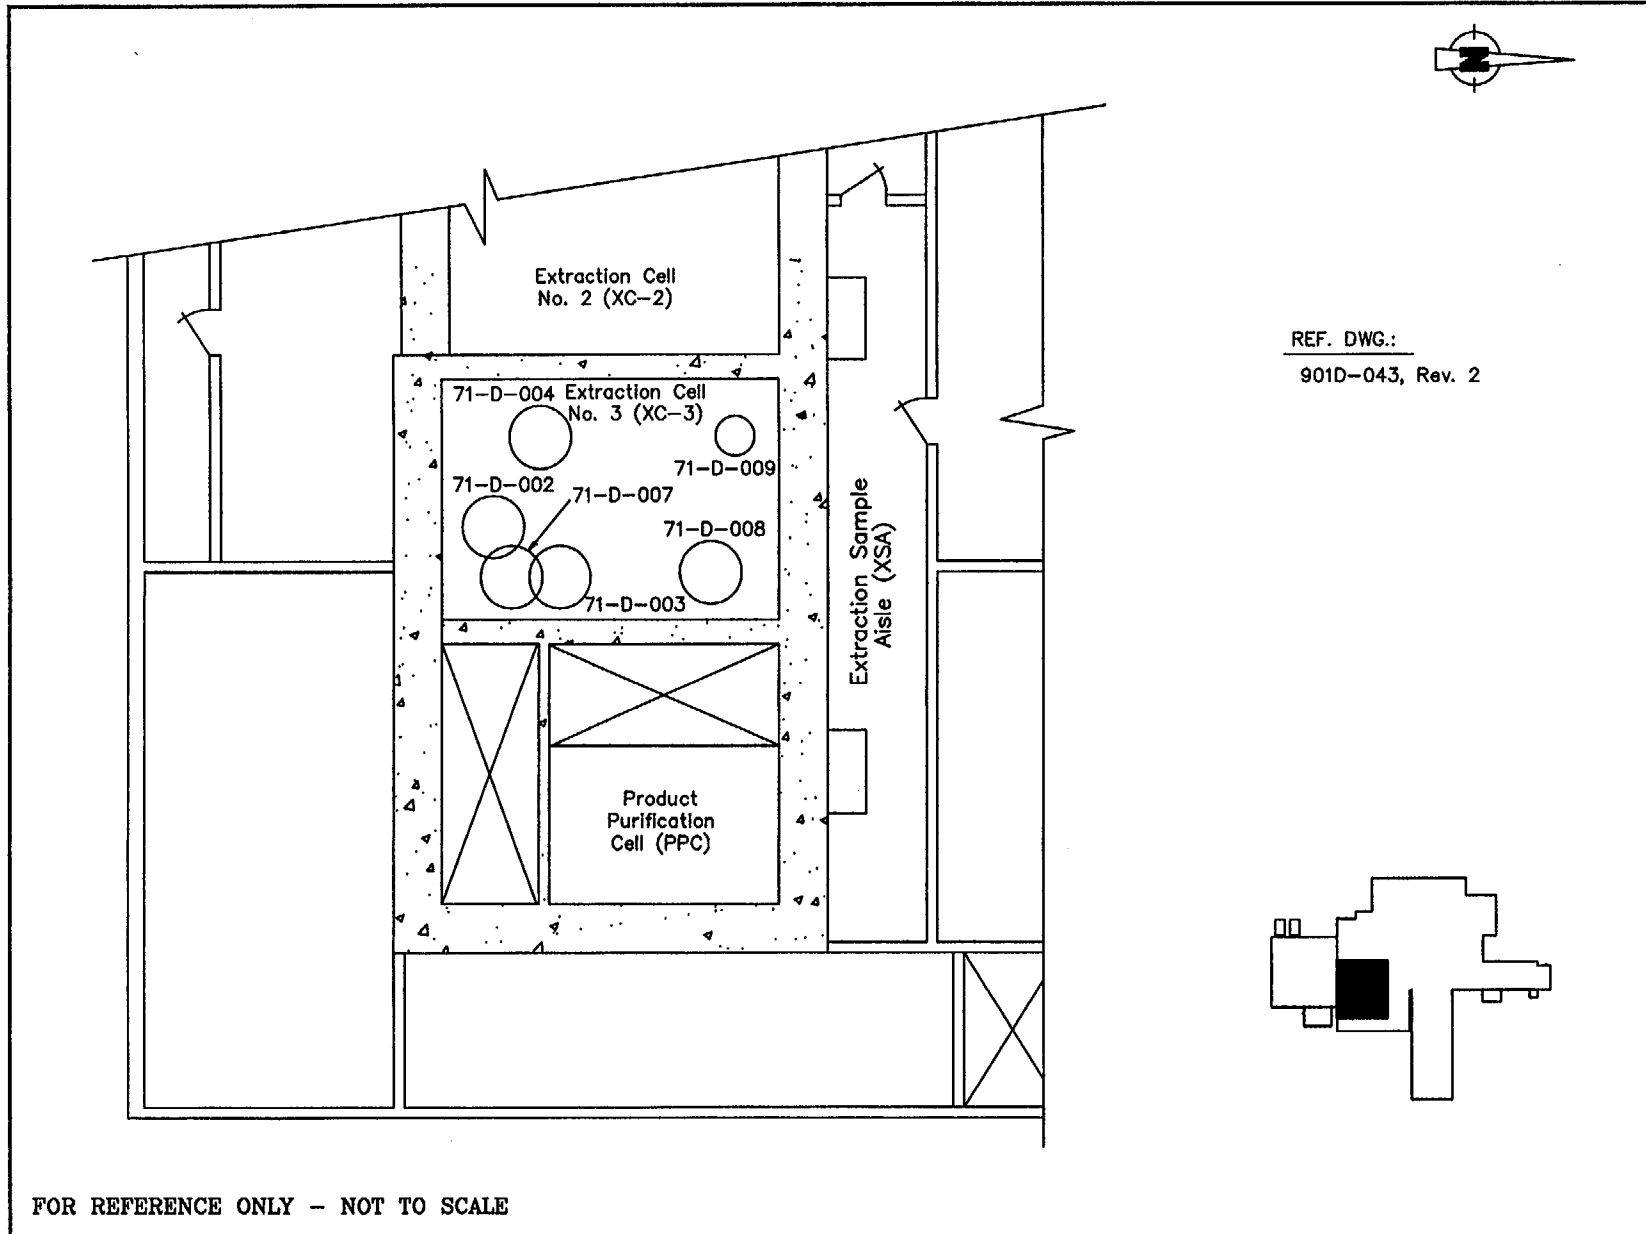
LWTS Plan at Elevation 131.0'
